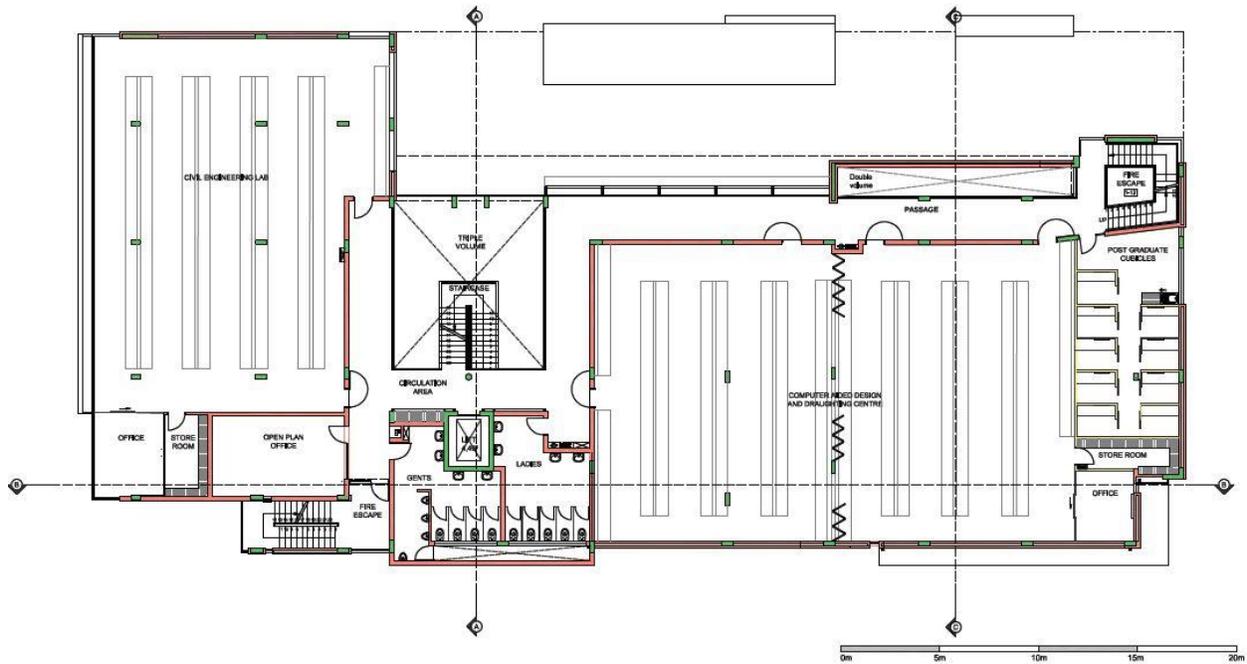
First Floor Plan of the Engineering Technology Building (ETB) on the Central University of Technology (CUT) campus in Bloemfontein
